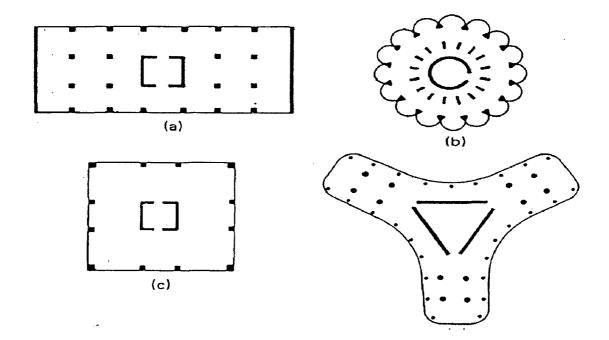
Typical Arrangement of Shear Wall in Building⁽⁸⁾
